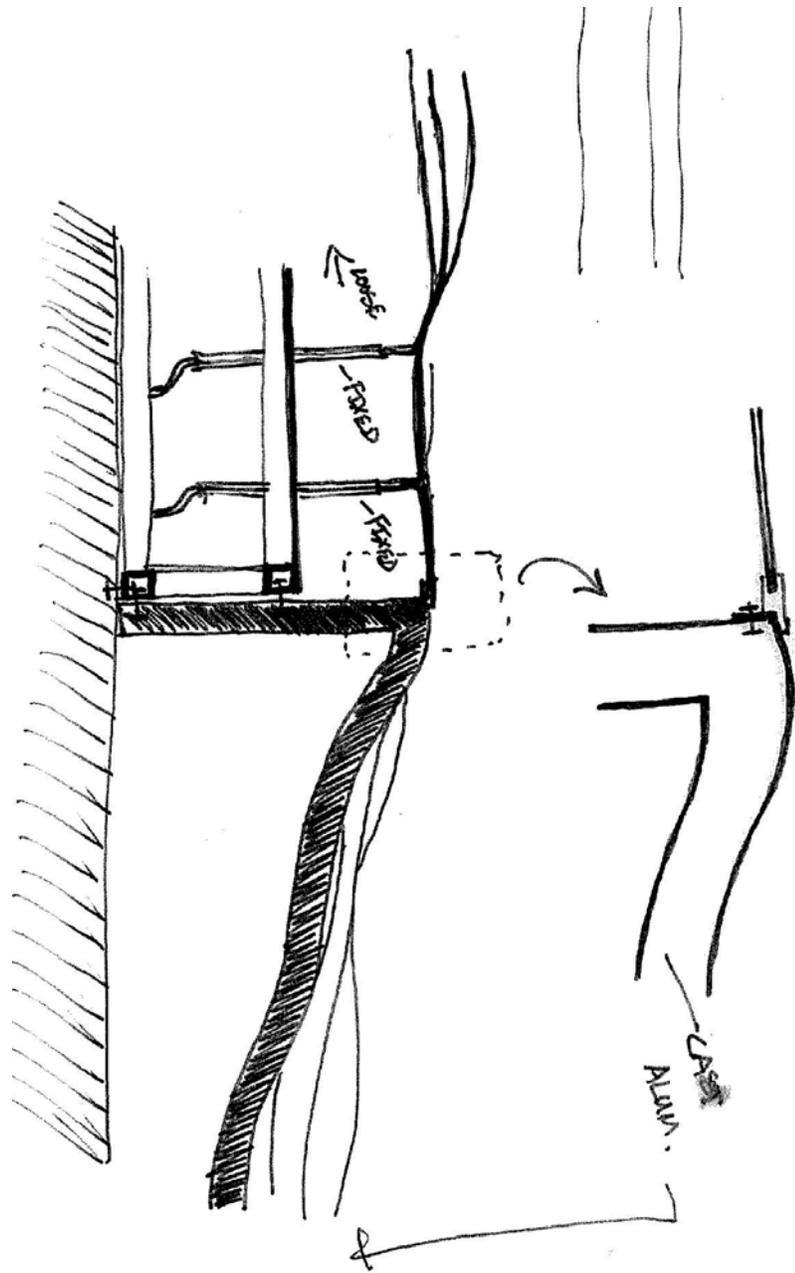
(Faulkner) Inert and Re-active wall Connection Detail Sketch
